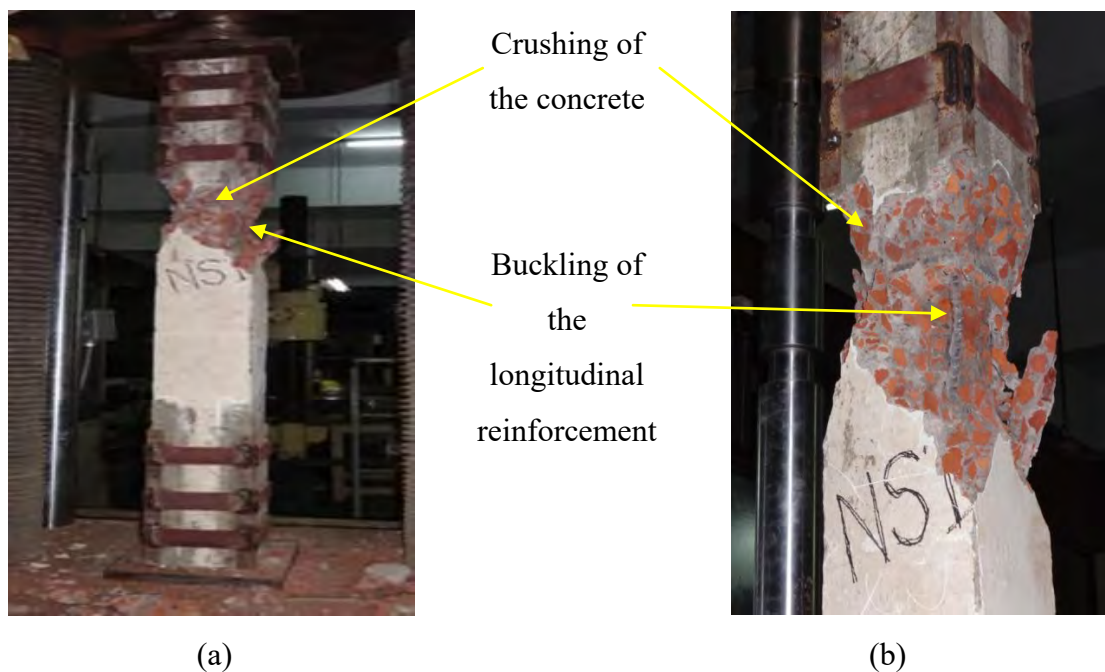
Failure mode of the unstrengthened RC column NC1, (a) Failure shape; and (b) Crushing of the concrete at the back face of the column
